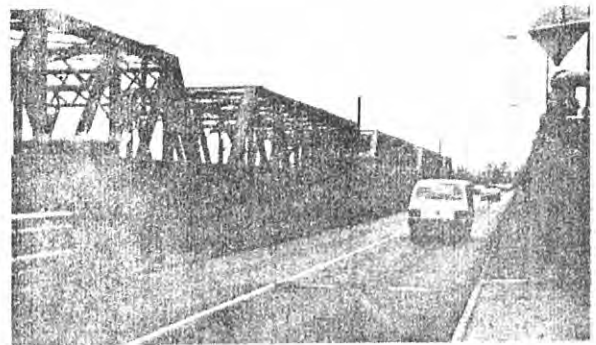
John Whitton's cellular girders were not deep enough to form tubes, hence the half-through or pony construction. Note the adjacent through trusses.
